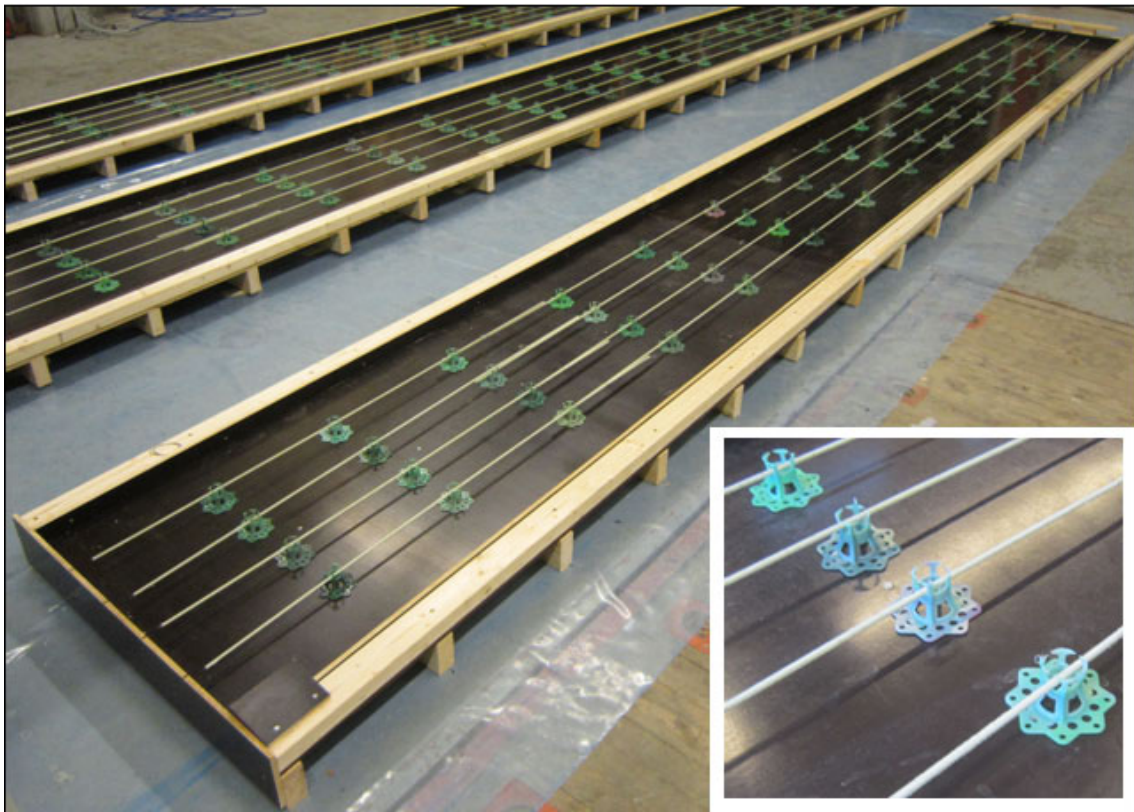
Longitudinal fibre-glass bars and final details of preparation of the formwork.
